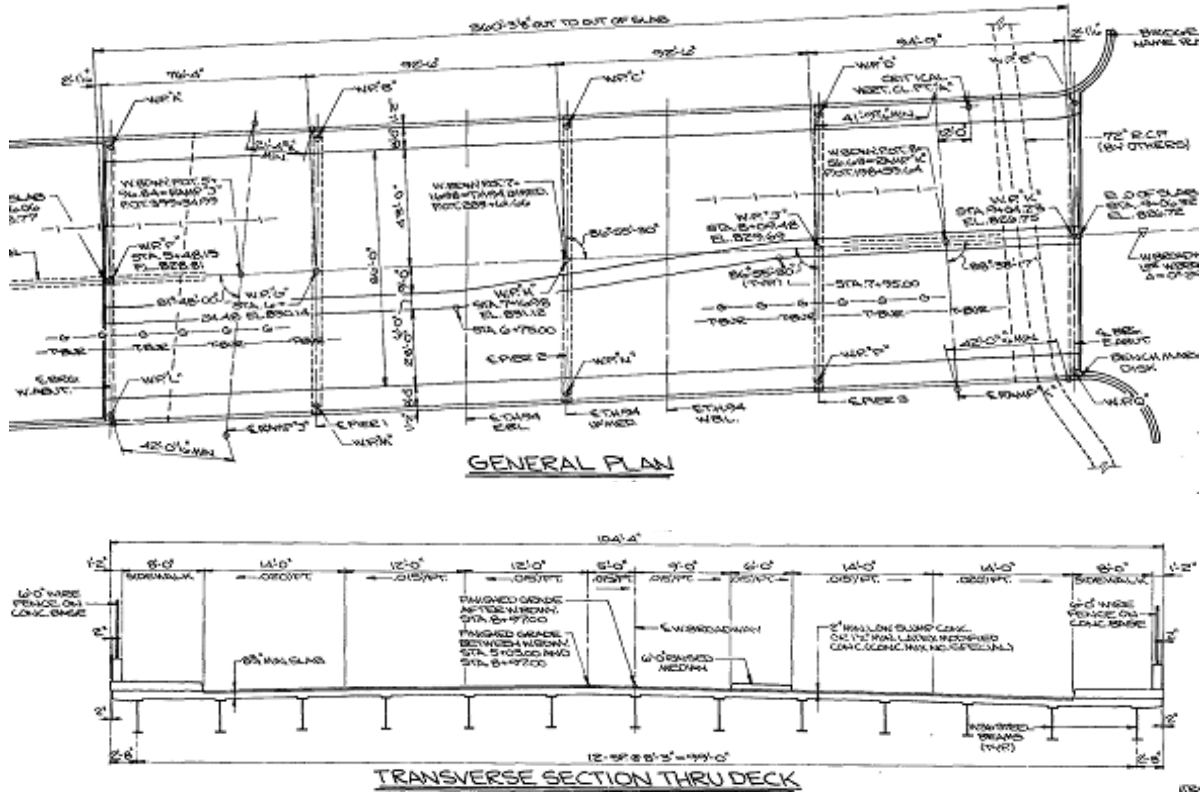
Plan view (above) and cross section (below), bridge 27815.
